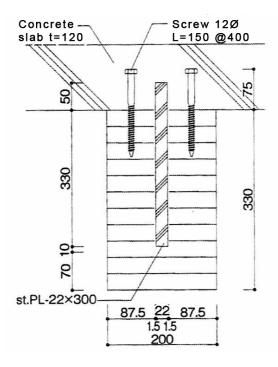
g - Cross section beam; Dimensions in [mm]
